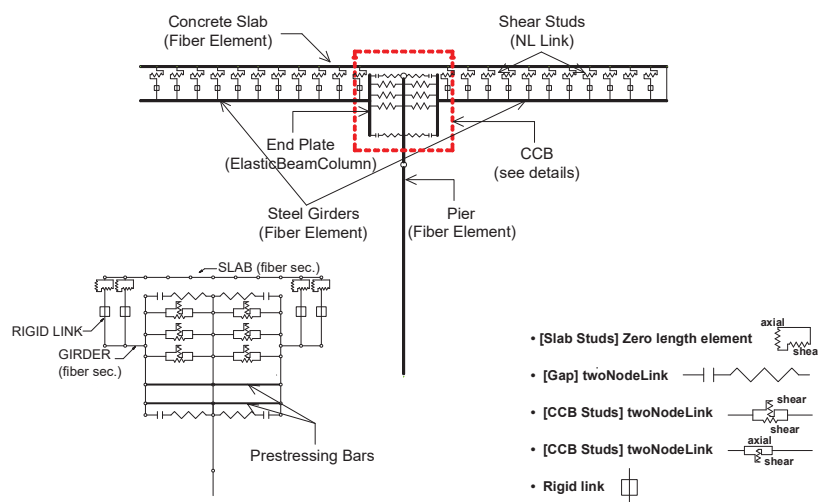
Numerical model of the pier-deck joint with Concrete Cross Beam
